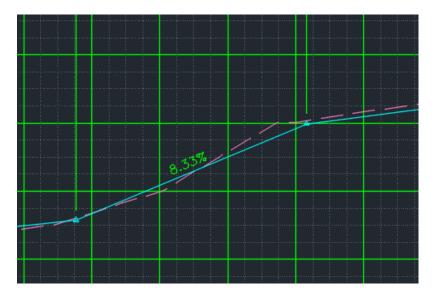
Street E.W.-1 – Vertical Profile at Proposed N.H.S. Crossing Location east of existing Simcoe Street North
